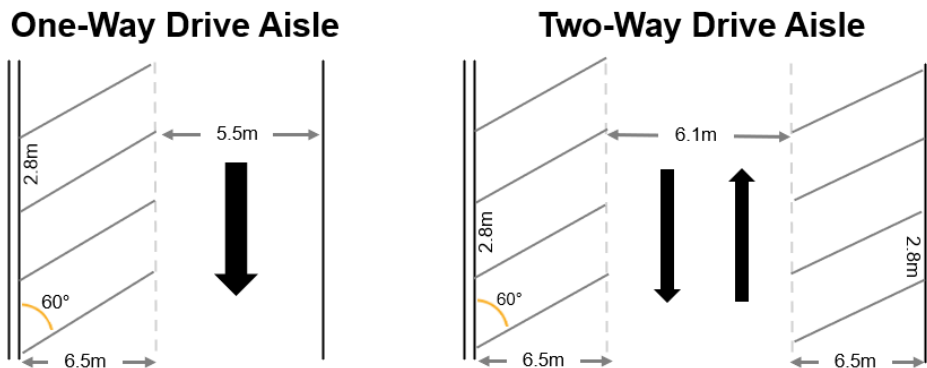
60-degree parking stalls and drive aisle dimension requirements
